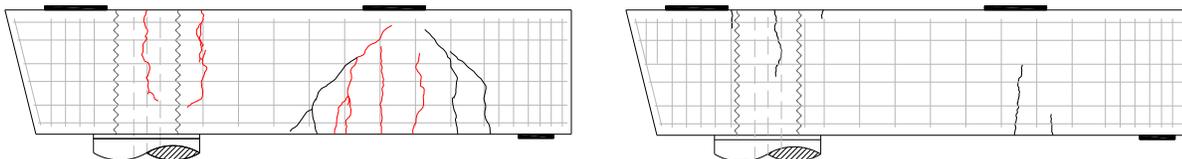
Crack Map of Reinforced Concrete (Left) and Pretensioned (Right) Bent Caps. Red Lines Indicate Cracks Exceeding AASHTO Limits.
